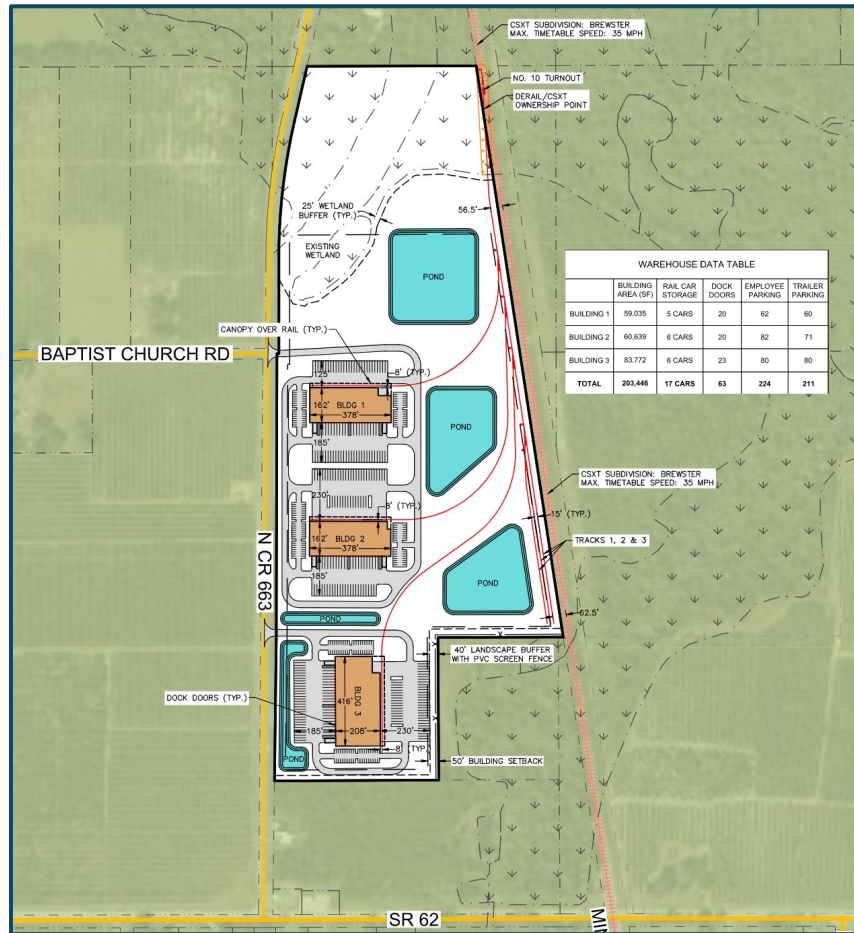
Rail-Centric Site 4 Conceptual Site Plan
